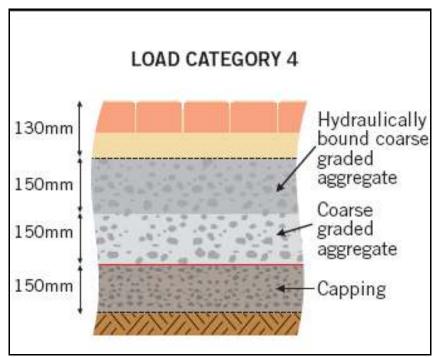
Section through a permeable surface for expected load category (Source: Interpave Permeable pavements – guide to the design construction and maintenance of concrete block permeable pavements dated 2010)
